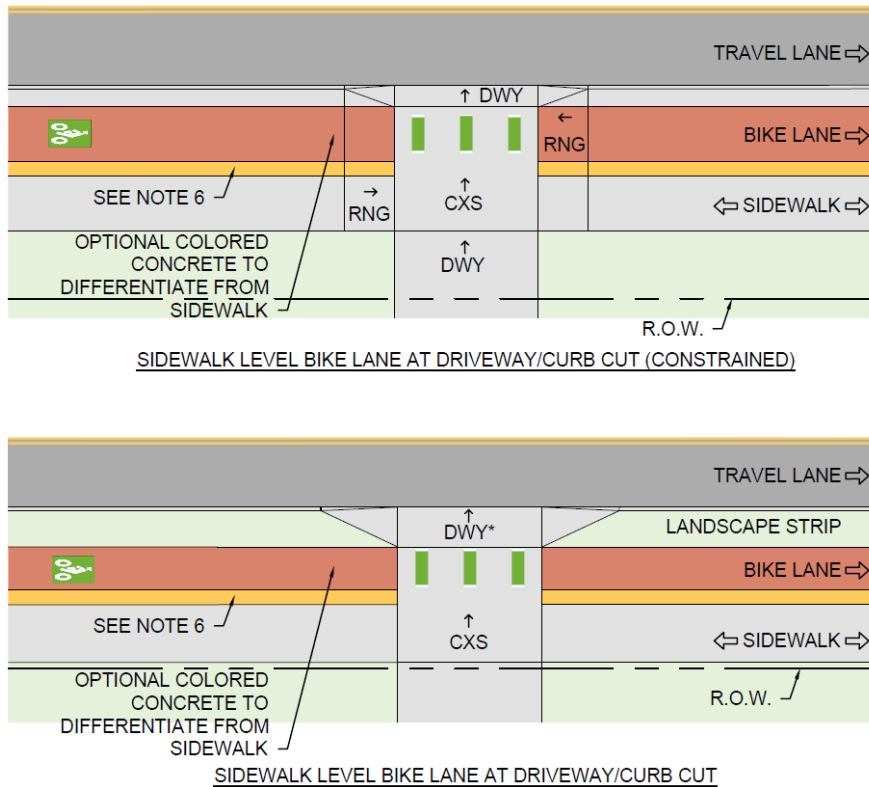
Typical Layout for Sidewalk Level One-way Separated Bike Lanes at Driveways
